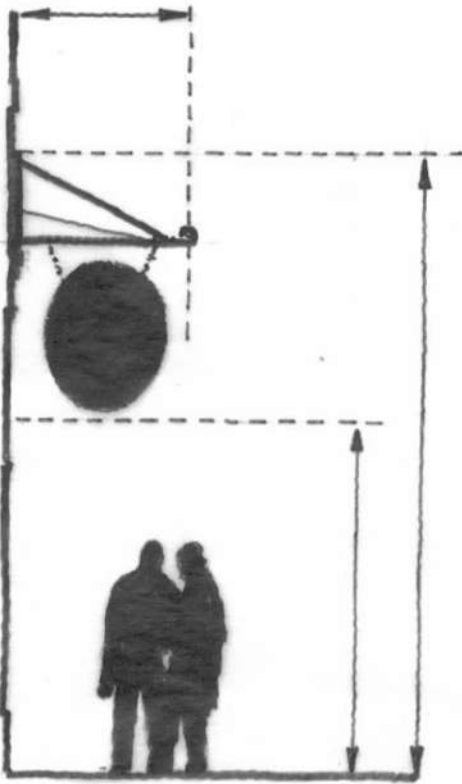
• Projecting Sign Location - projecting signs should not exceed a mounted height of 14 feet above sidewalk level and should maintain at least 8 feet of clearance
